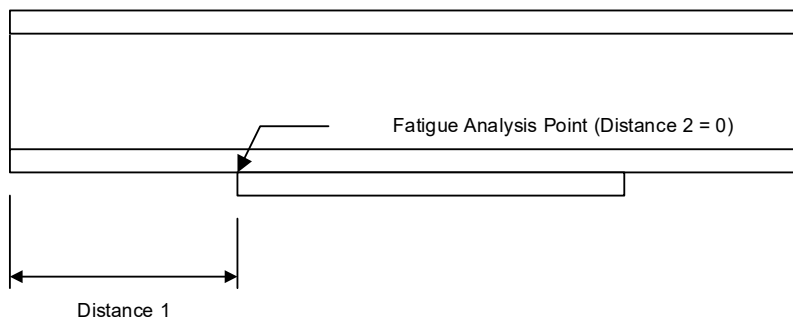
Fillet Weld at Bottom Cover Plate
